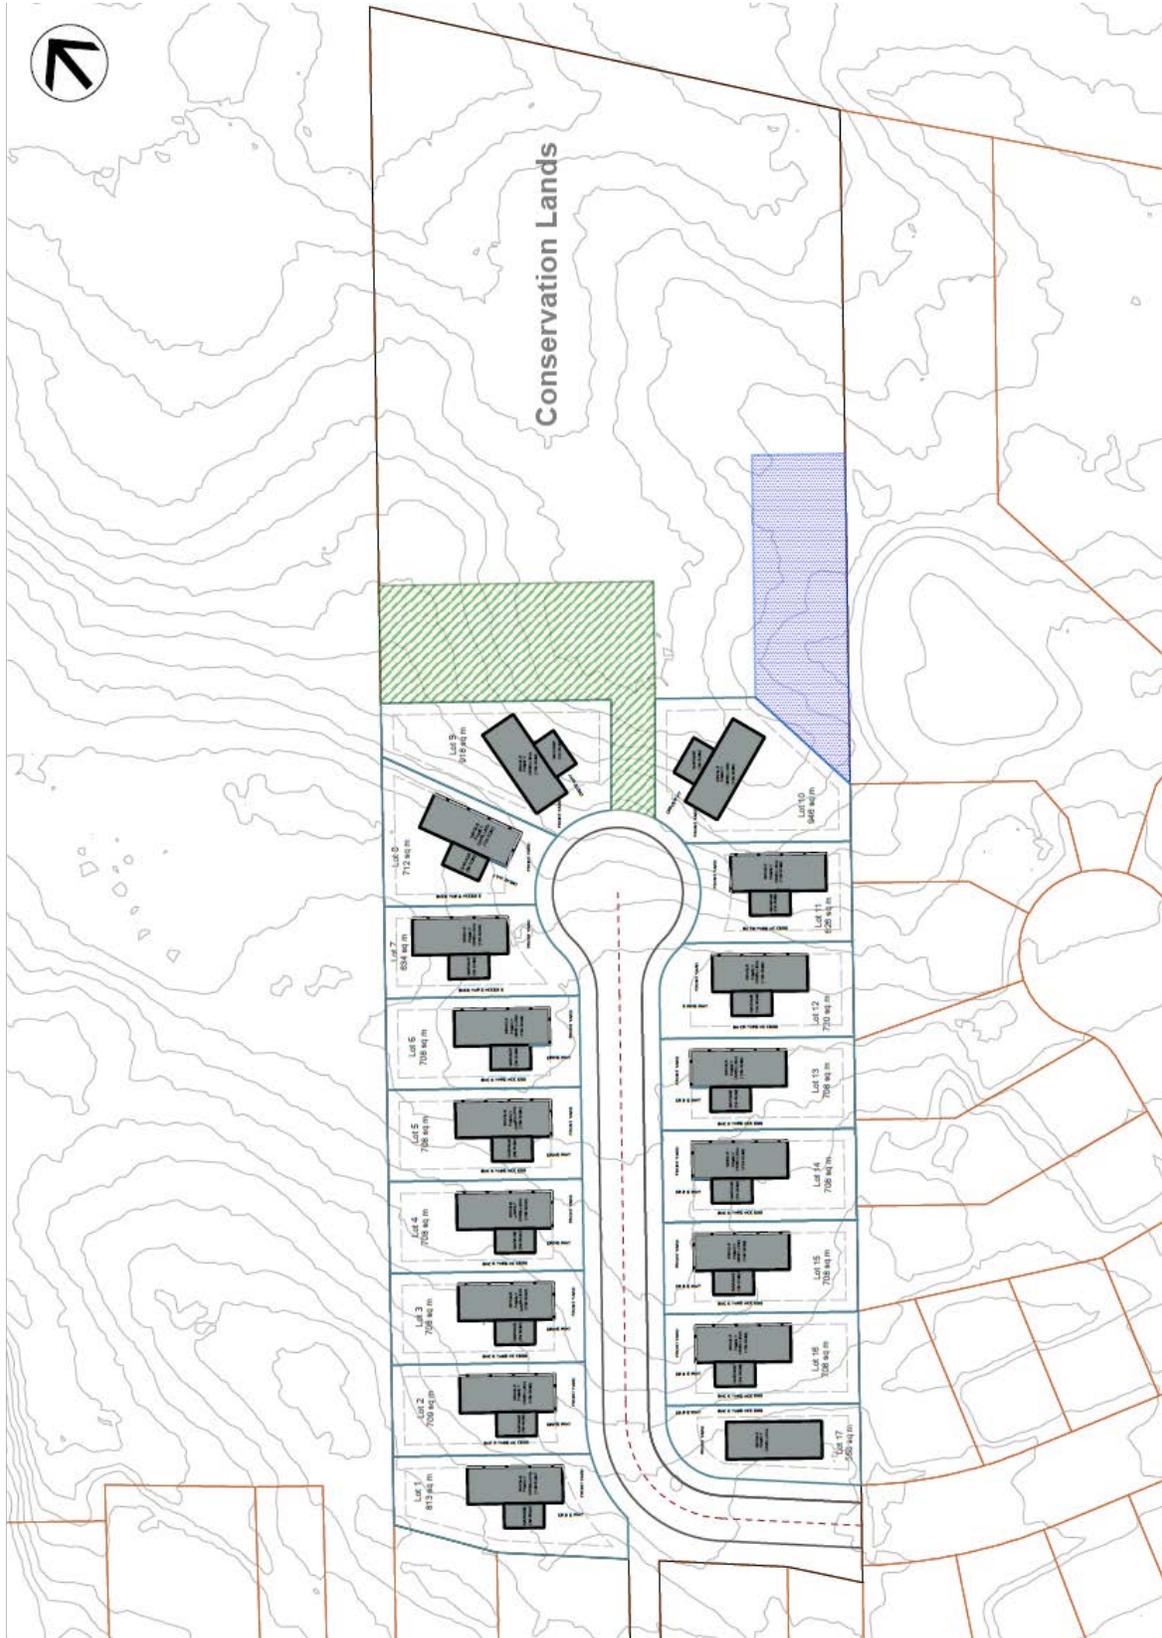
Site development plan by UPLAND Planning + Design Studio dated May 25, 2021
